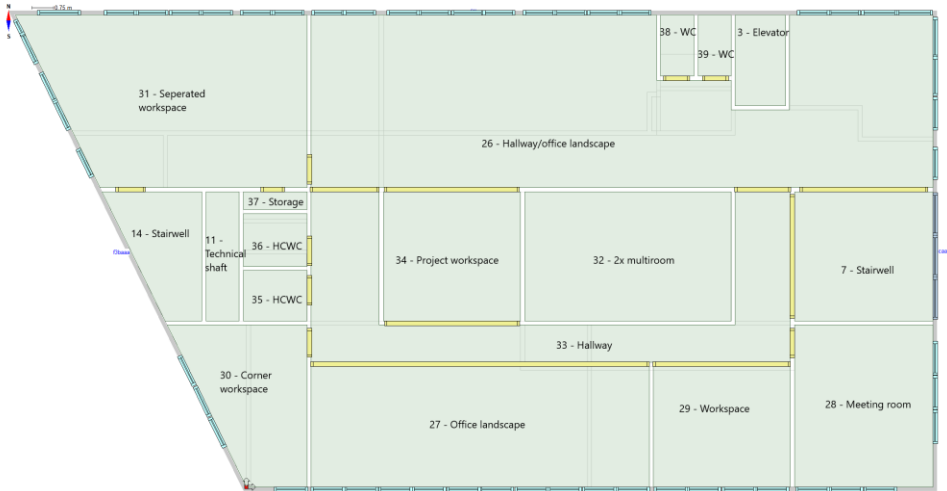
Floor plan of the 3rd floor at ZEB lab, clipped for BEM in IDA ICE
